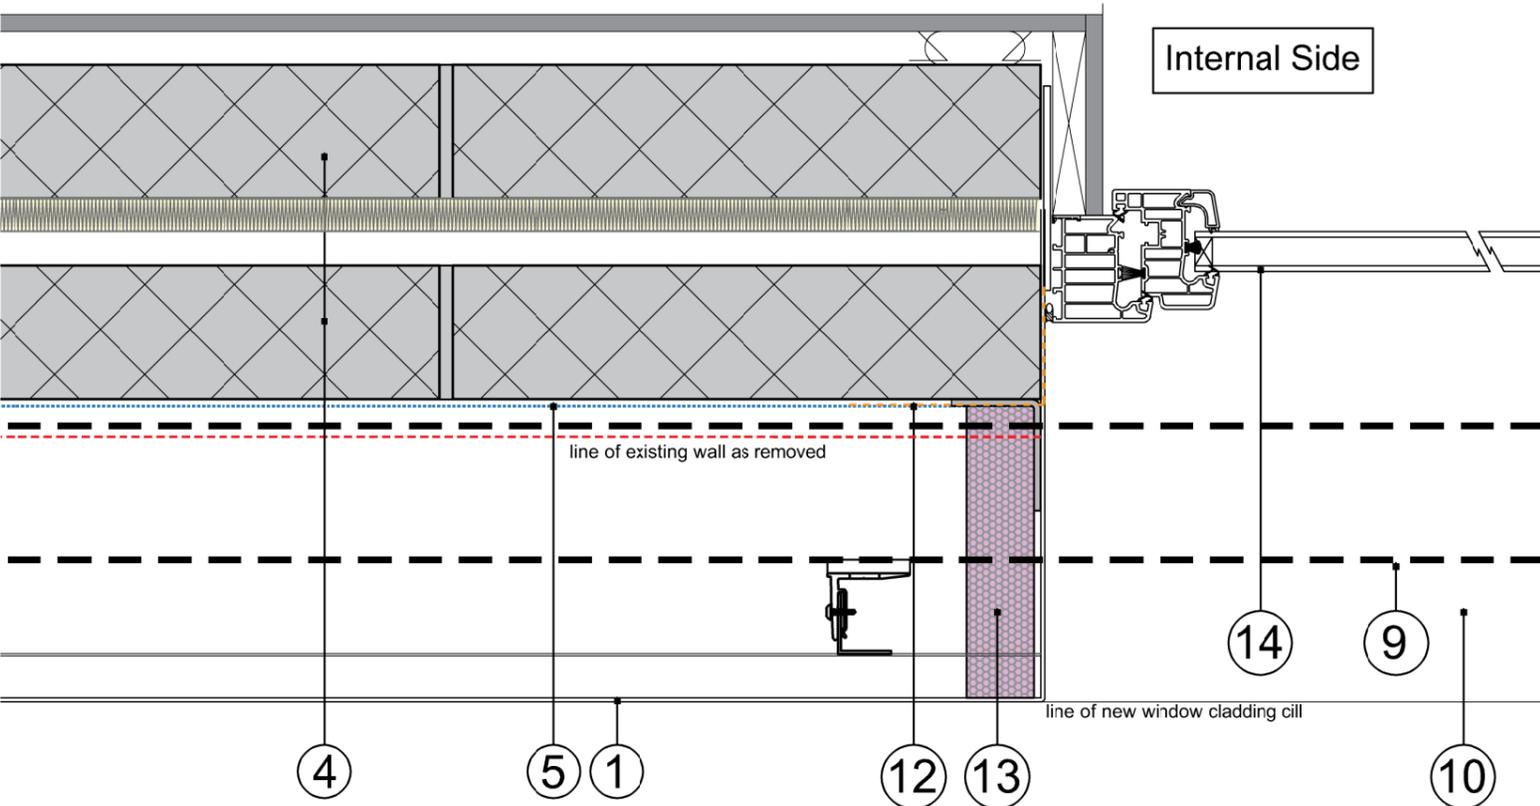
/2 - Typical window head - SECTION 1:5
